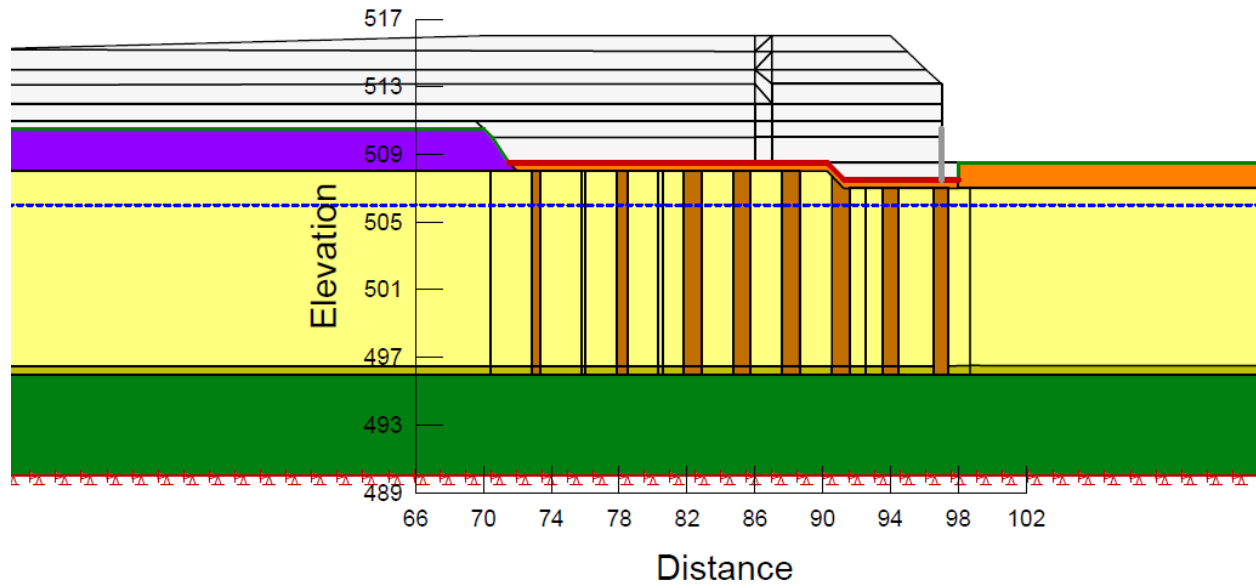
FEM North Abutment Profile Model Insitu Stage
